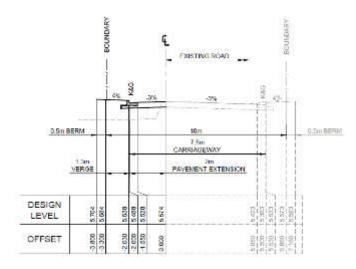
Section of full Pheasant Place (Craig & Rhodes Civil Engineering Plans Sheet 151), noting 1.3m verge
